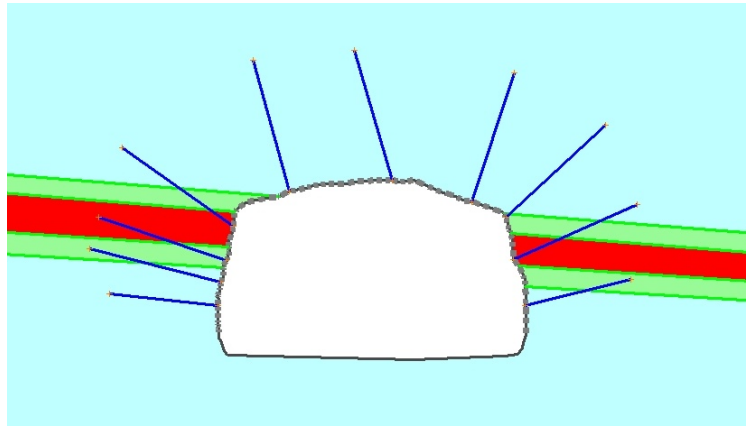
Tunnel cross section of station 6530, the dimensions are in meters.
